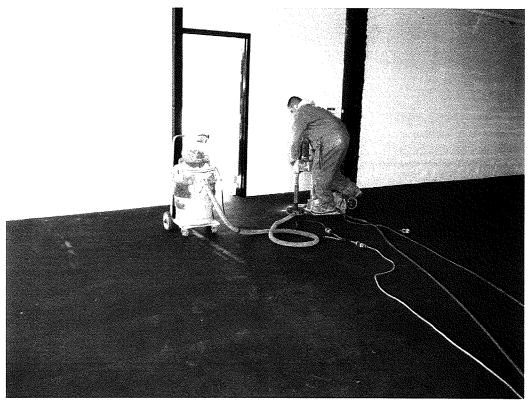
, Coring through concrete floor inside building at soil-gas sampling location SG-9.
